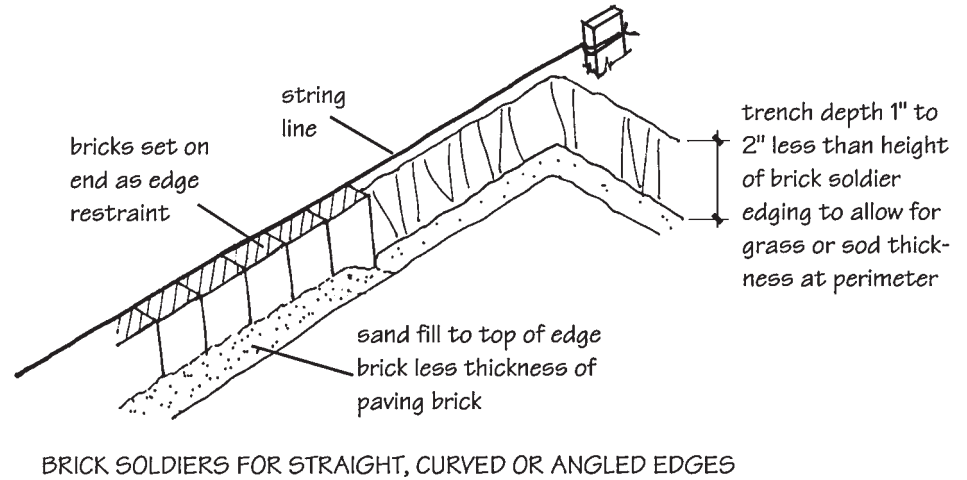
Alternative edge restraints for flexible masonry paving.
